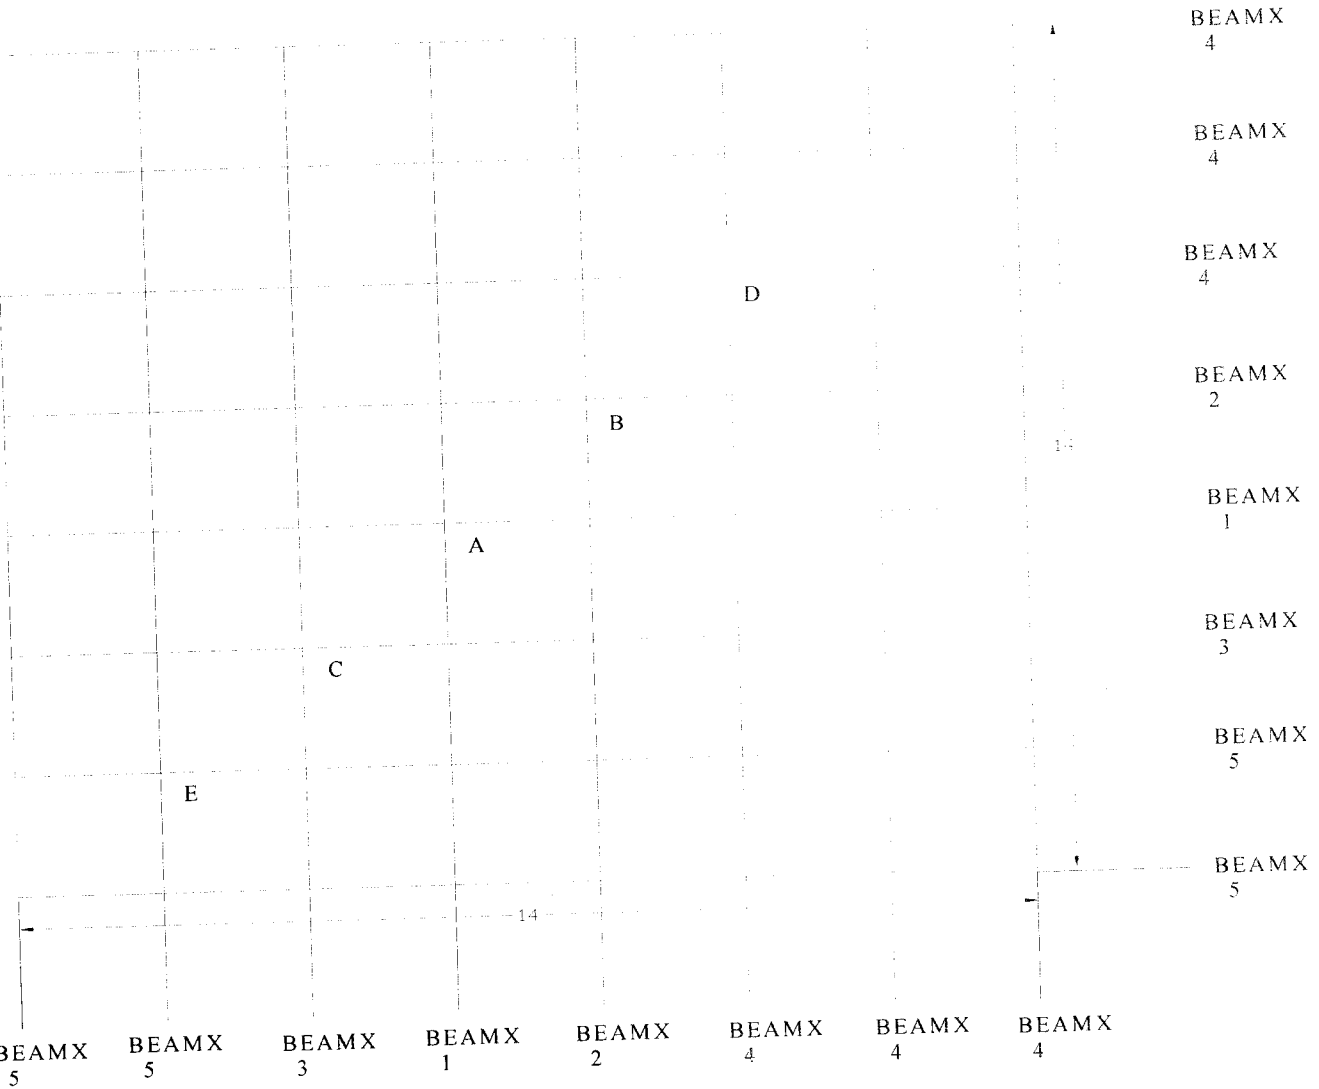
BEAMS FOR GRID FLOOR OF SPAN 14m
